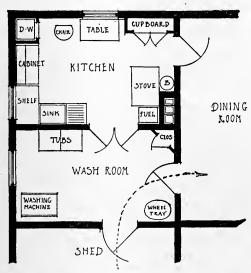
A large kitchen, 14 by 18 feet, so rearranged that food and laundry work are separately grouped, while the stove is common to both.
